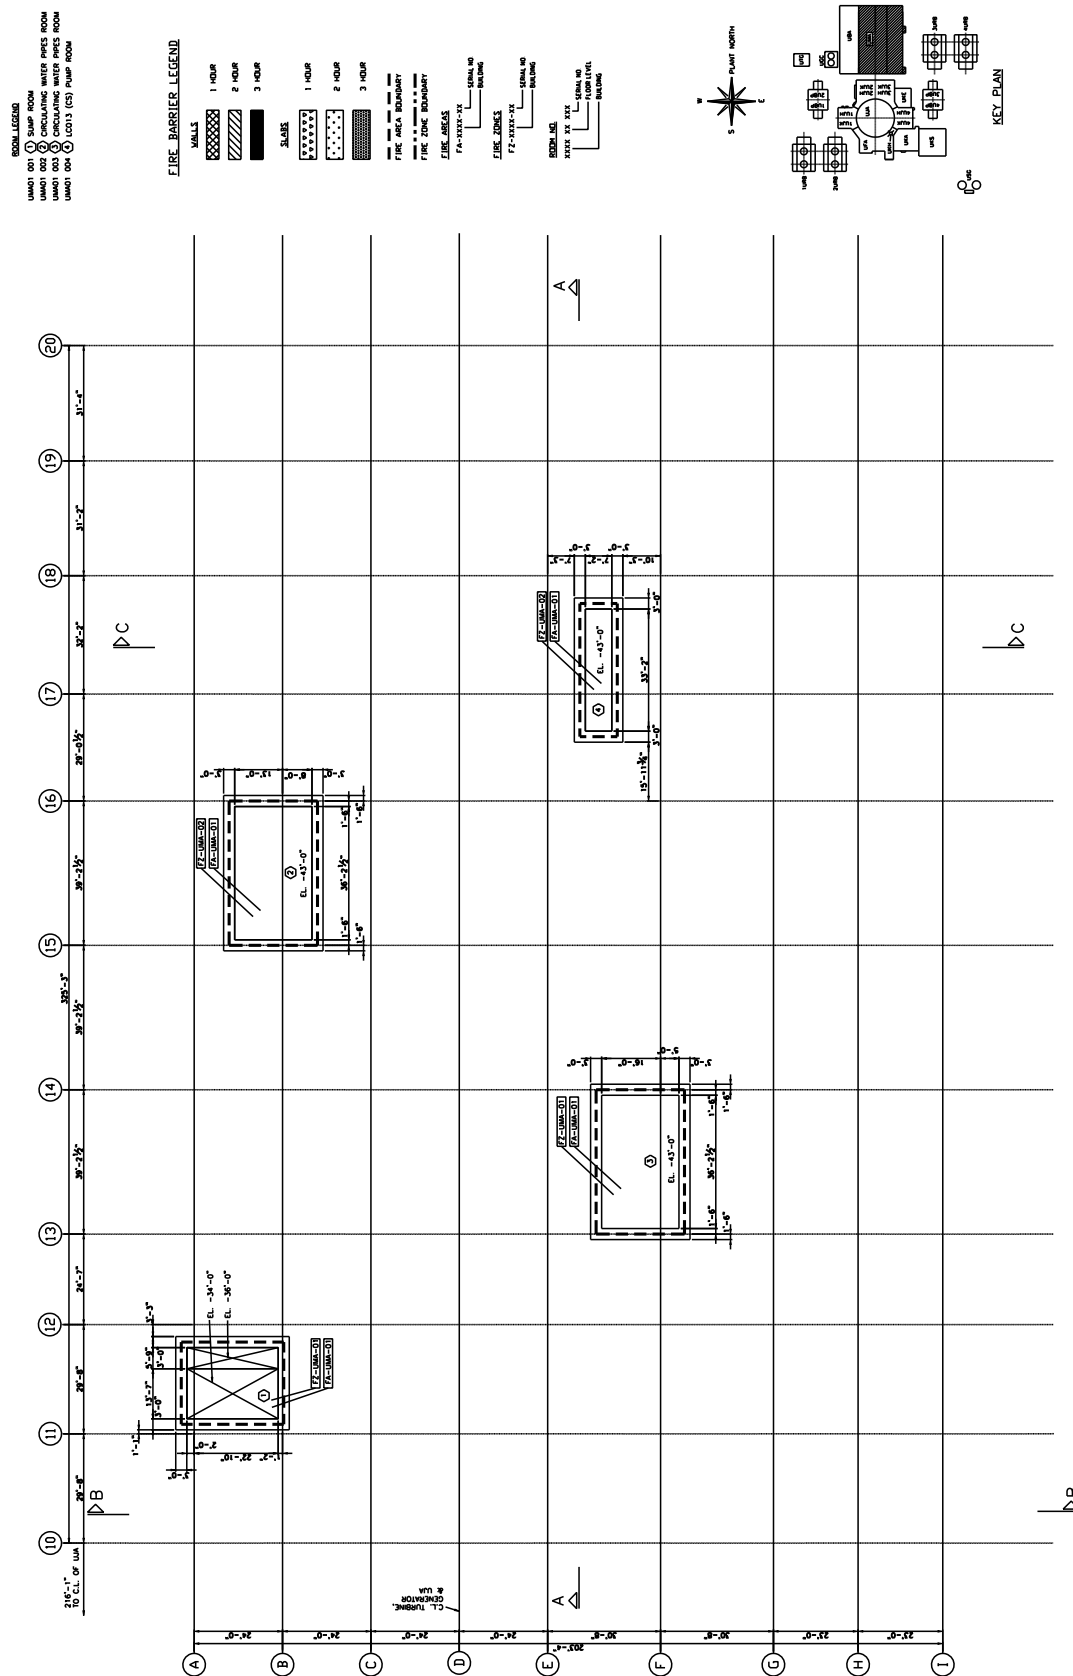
B-6—{Fire Barrier Location, Turbine Building Roof Plan}
